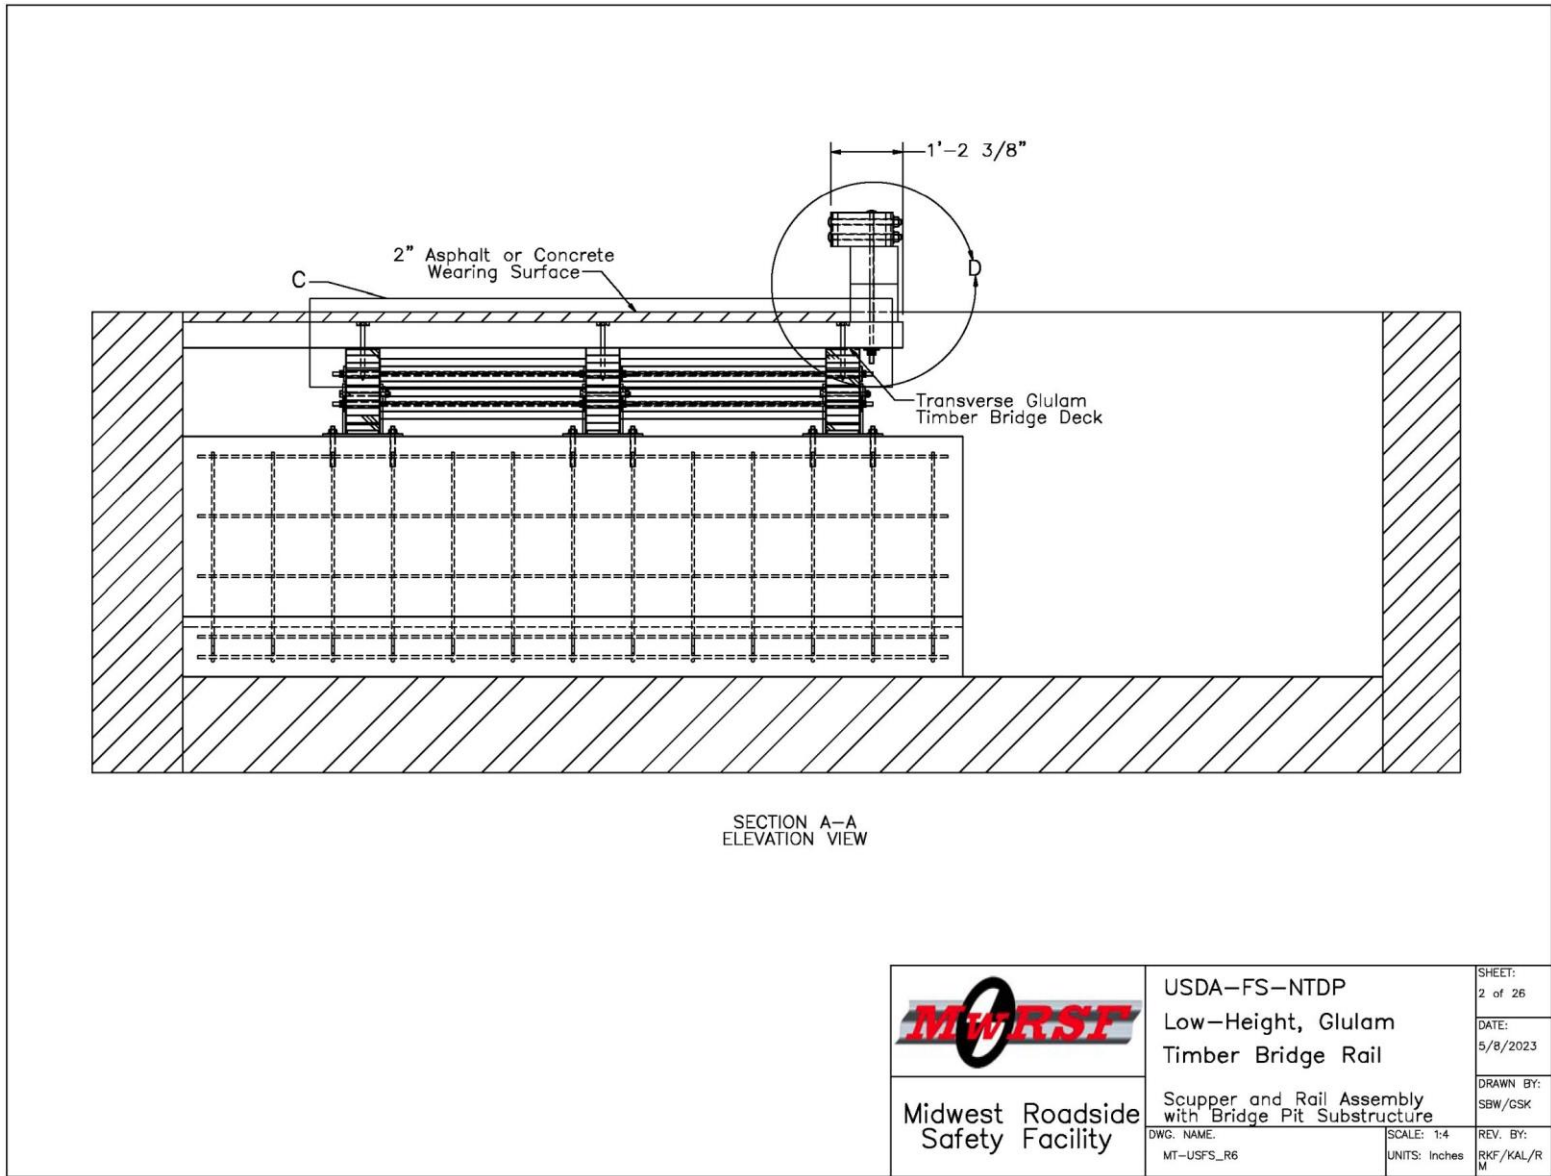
USDA-FS-NTDP Low-Height, Glulam Timber Bridge Rail: Scupper and Rail Assembly with Bridge Pit Substructure
